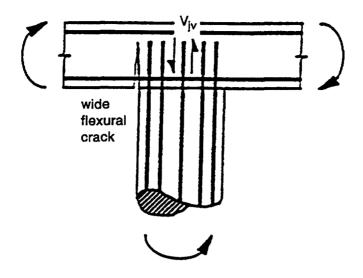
Joint shear mechanism in cap beam/column connections (from ref. 18).
